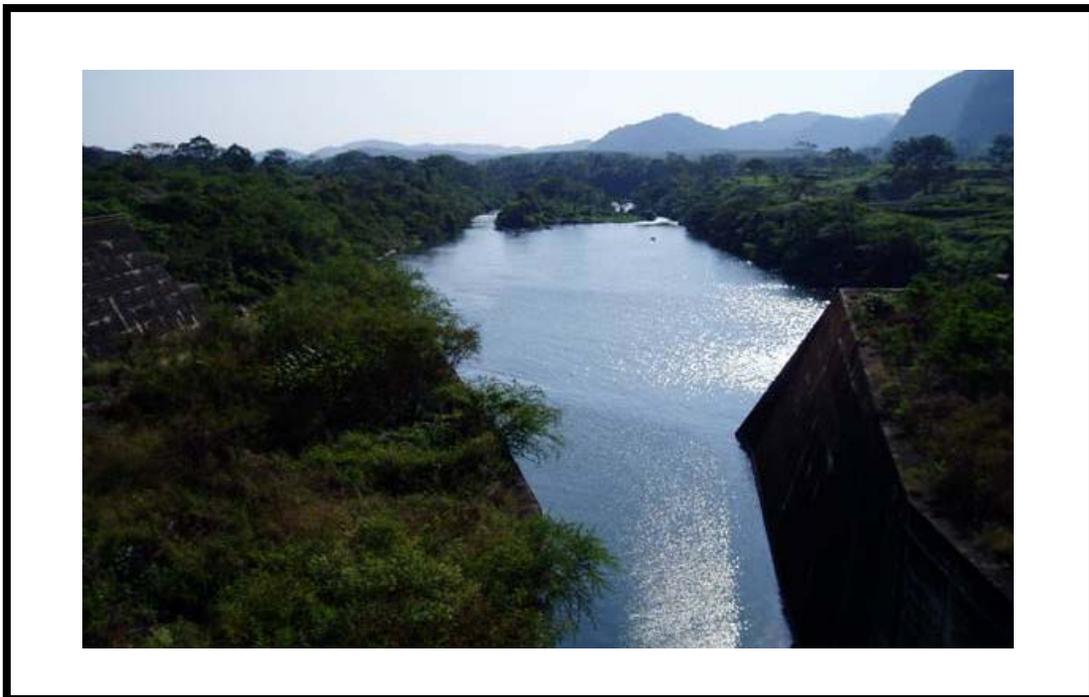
The 3 dam diversion tunnels existing into the Santo Domingo River.
